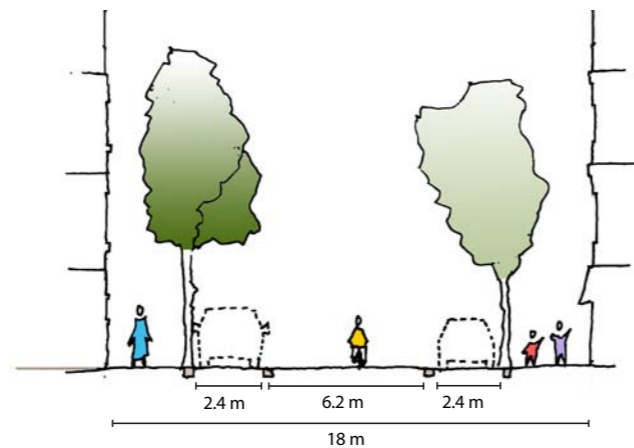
Section of secondary street (residential or mixed-use) with on-street parking
